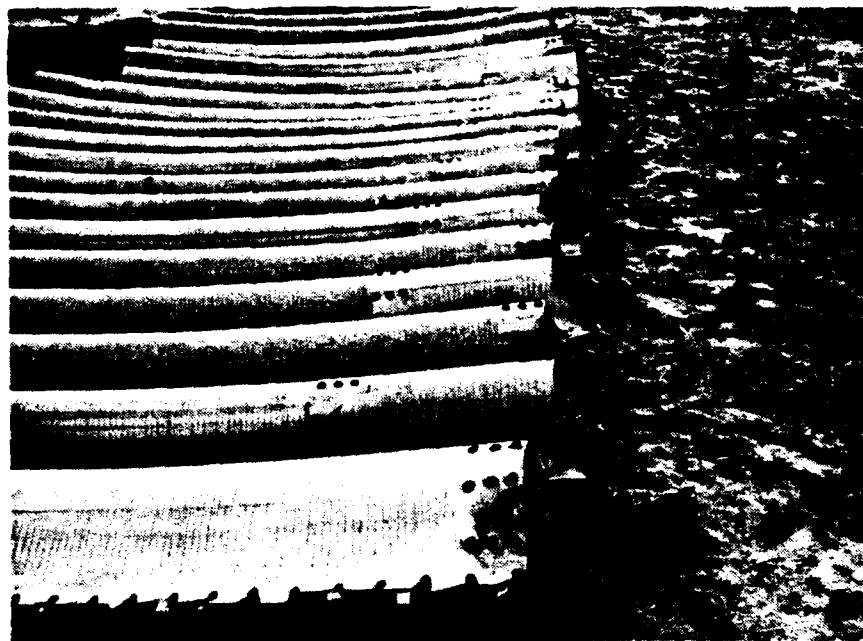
Liner failure at longitudinal failure plane, PAS-4.
